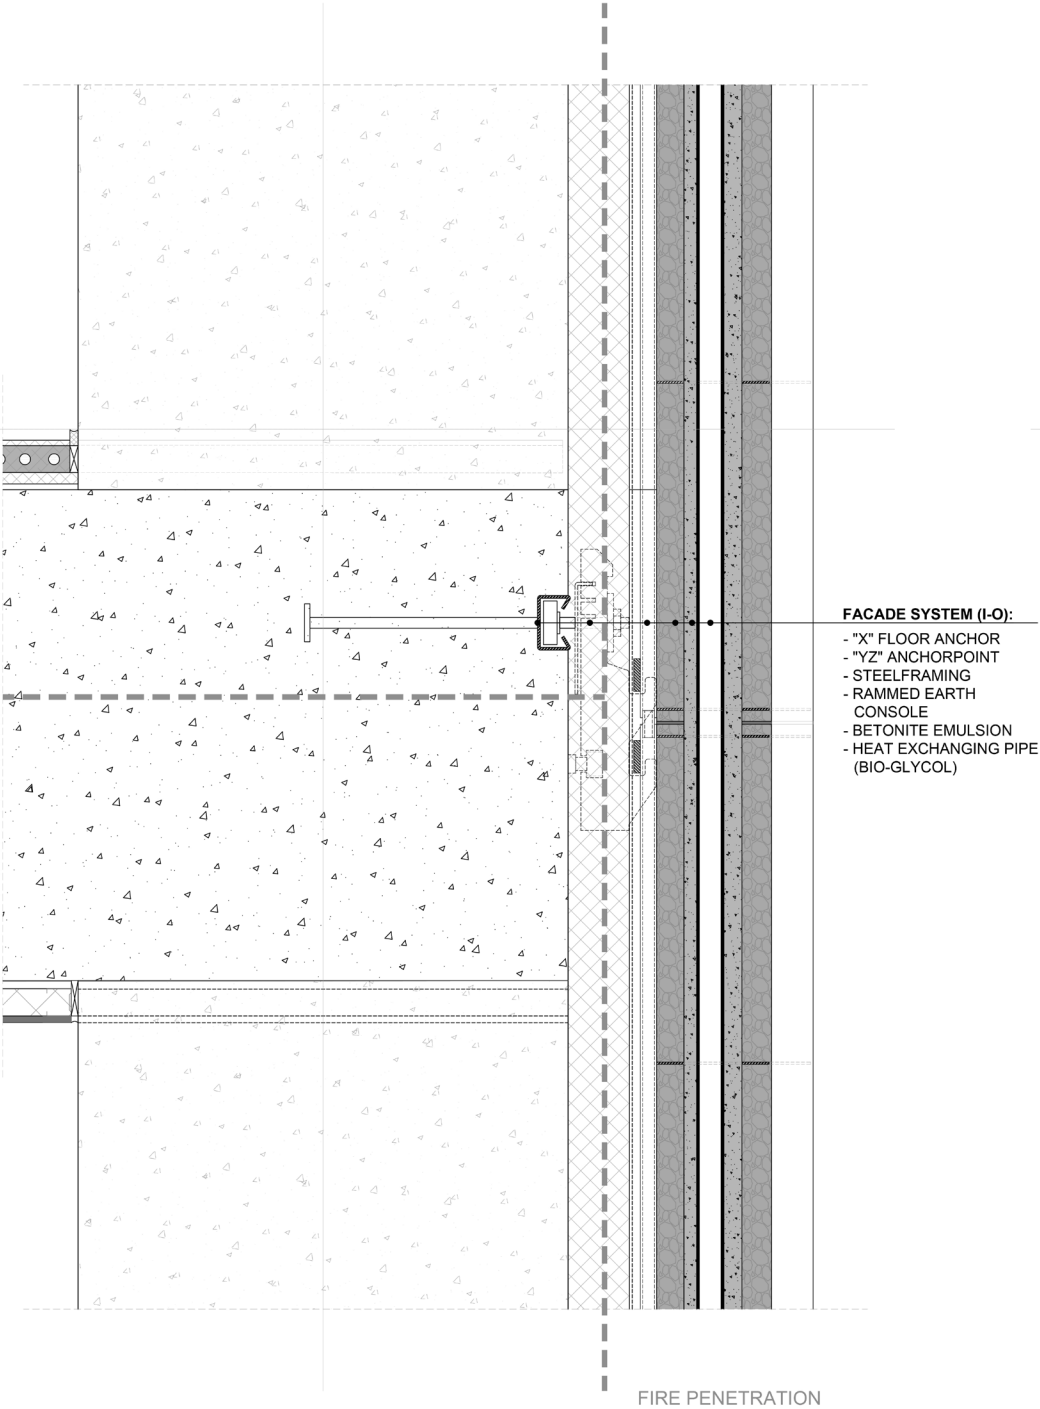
5 CONNECTION OF PREFAB ELEMENTS
